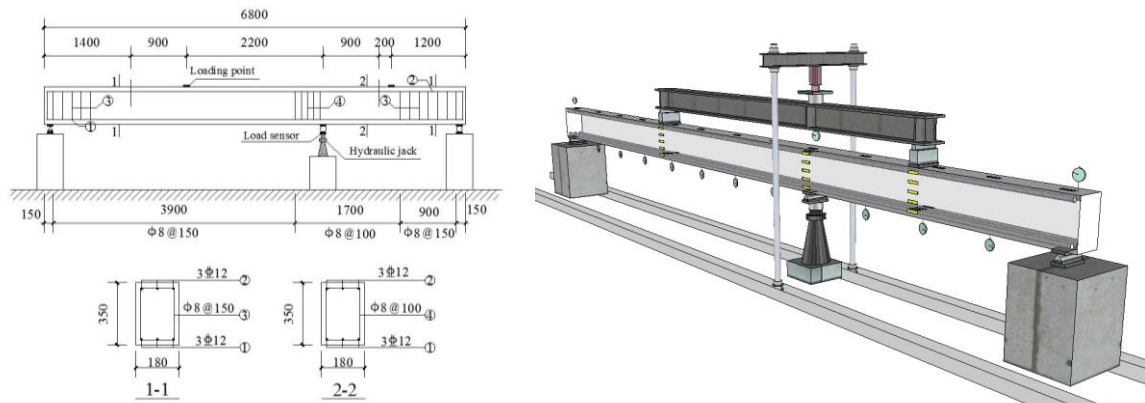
(a) Reinforcement layout of the continuous beam (mm); (b) Instrumentation layout of the displacement and strain gages for static test
